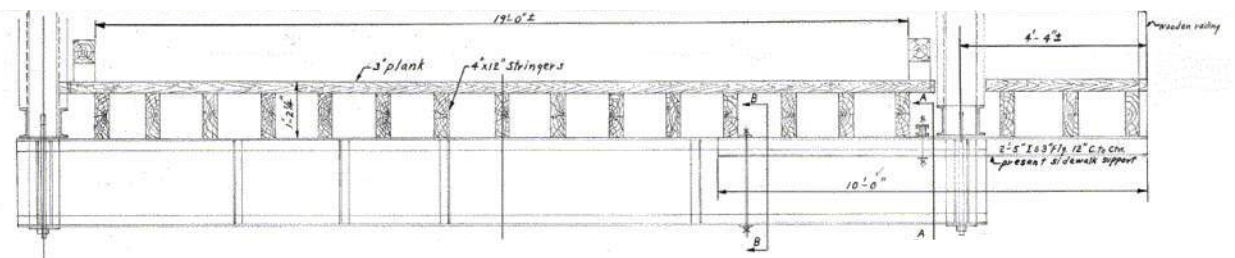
Cross section of the original wood deck of Bridge #01349. This was replaced by a steel "singing" deck in 1952. Image Courtesy of CTDOT State Project #158-0050, Sheet 3 of 4; (11/6/1948).
